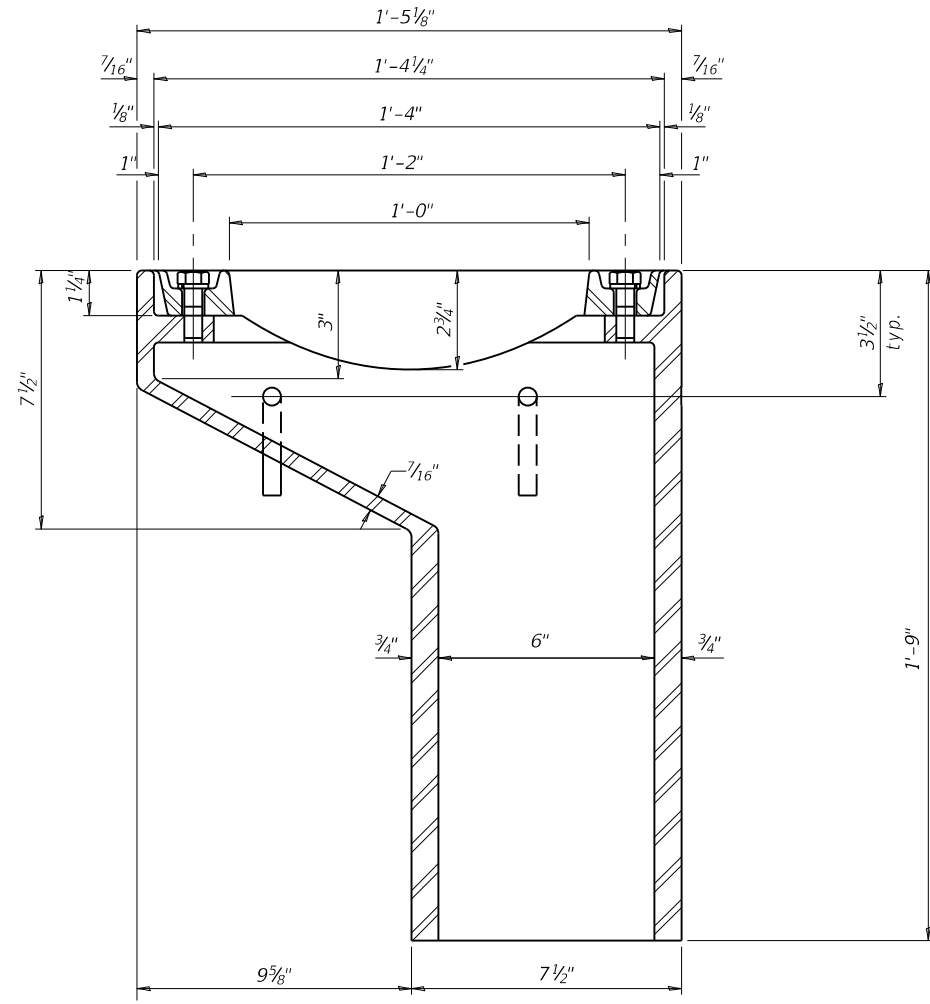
DETAIL OF DRAINAGE SCUPPERS /FLOOR DRAINS
